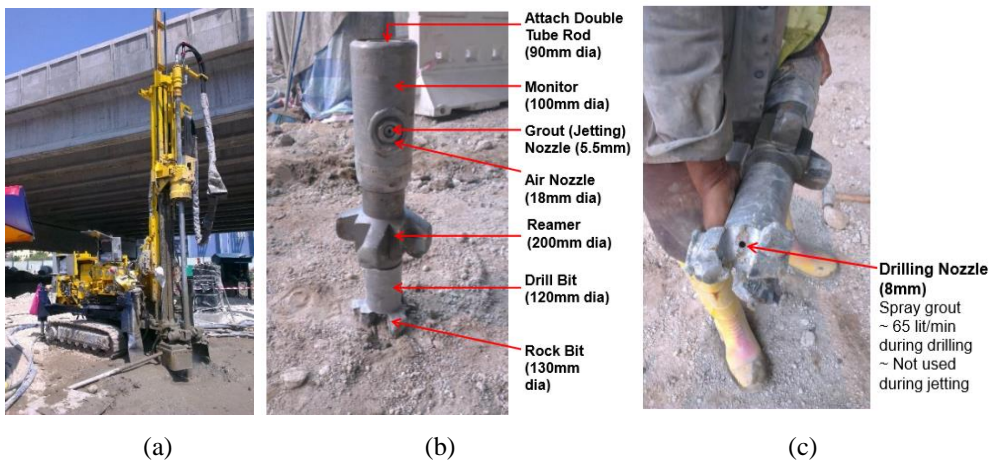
(a) Jet Grouting done for MRT project at Malaysia (b)-(c) Double fluid type jet grouting systems (source: Keller ASEAN)
